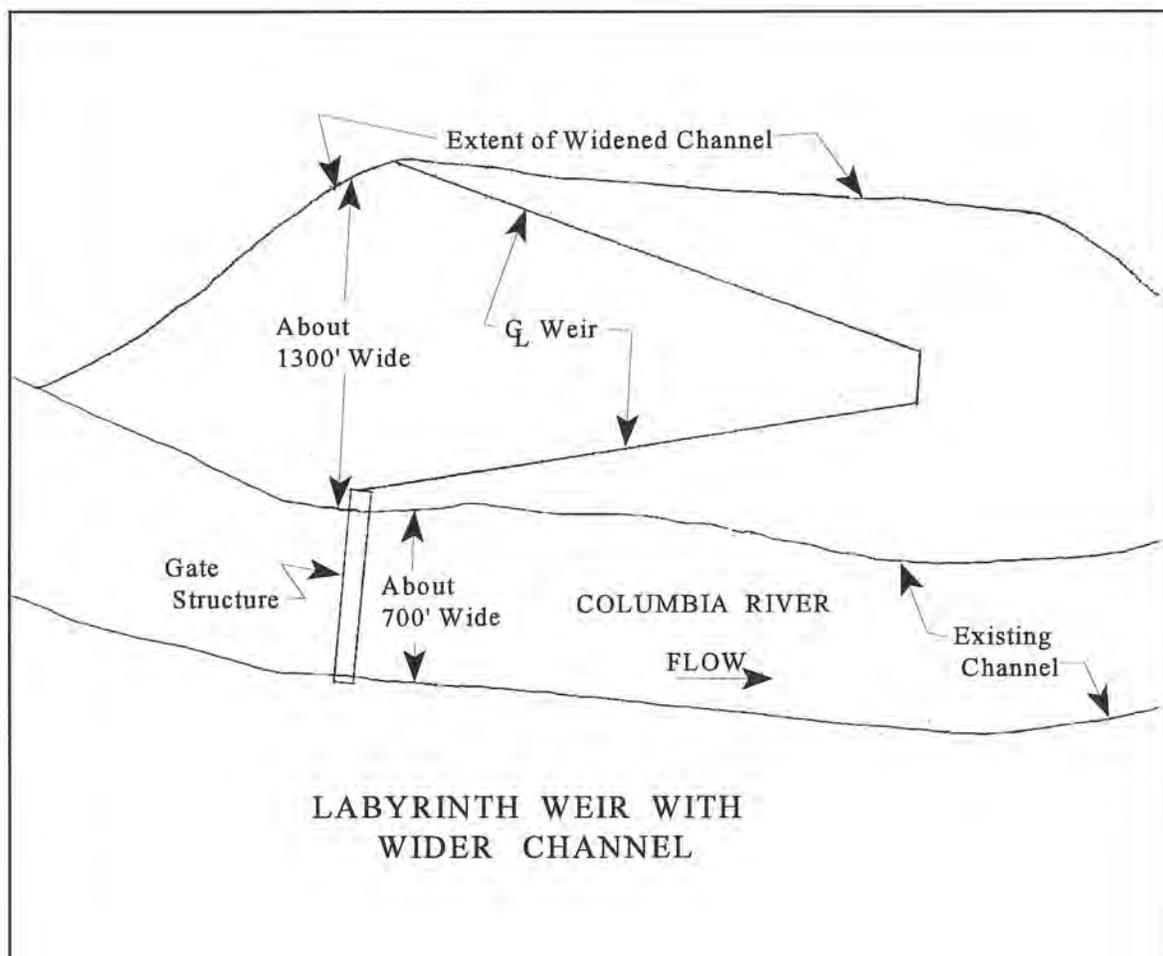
Plan view of alternative No. 7 to widen the river channel with a labyrinth weir and gate structure. (fn: alter#7-2.wpg)
